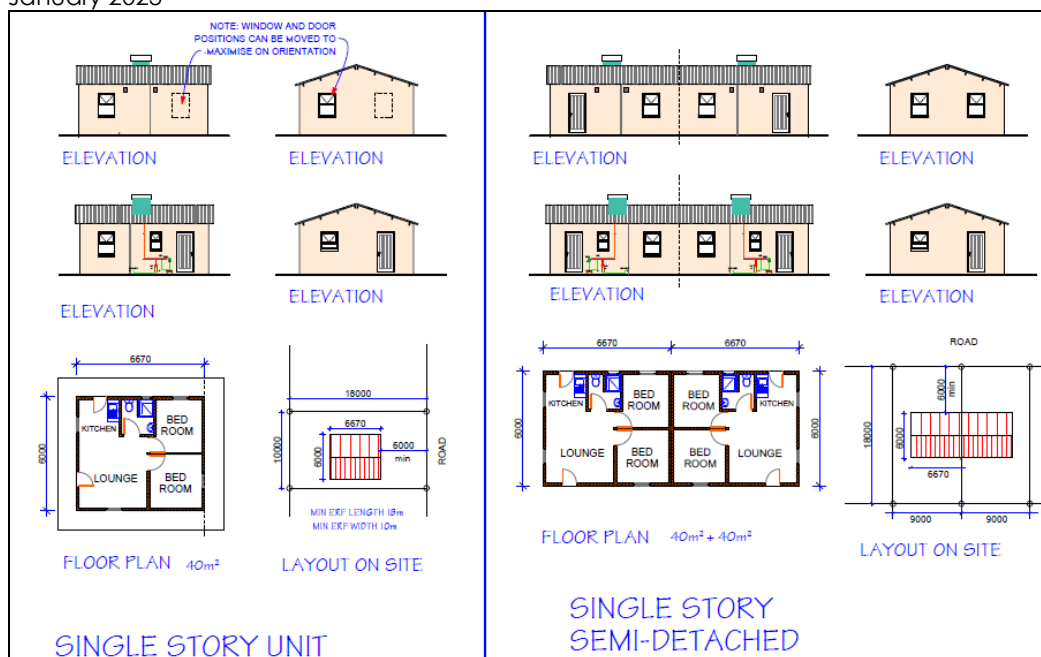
Typical designs for proposed single storey units (source: Keith Lurie Architecture)
